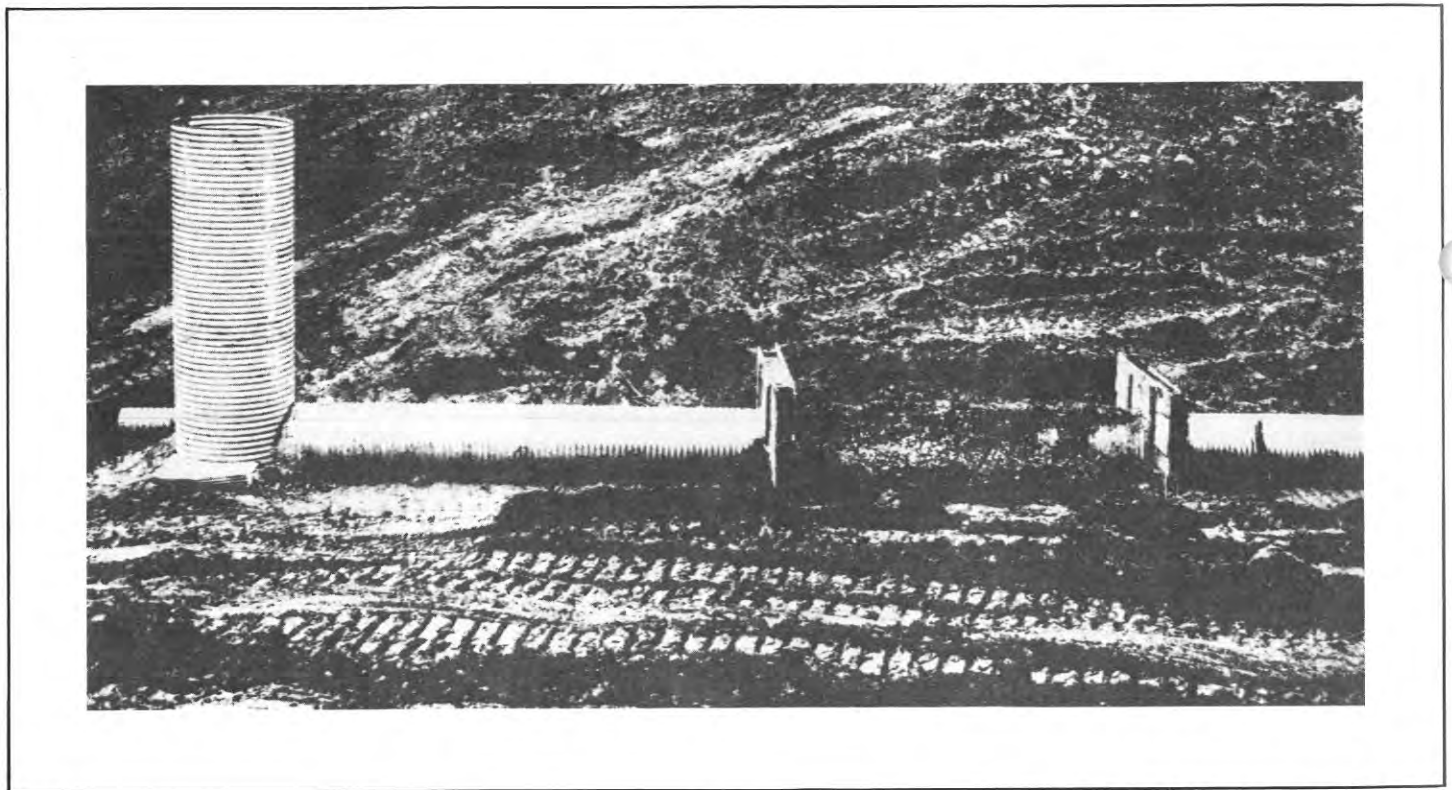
CORRUGATED METAL-PIPE SPILLWAY WITH ANTI-SEEPAGE COLLARS PRIOR TO BACKFILLING.
